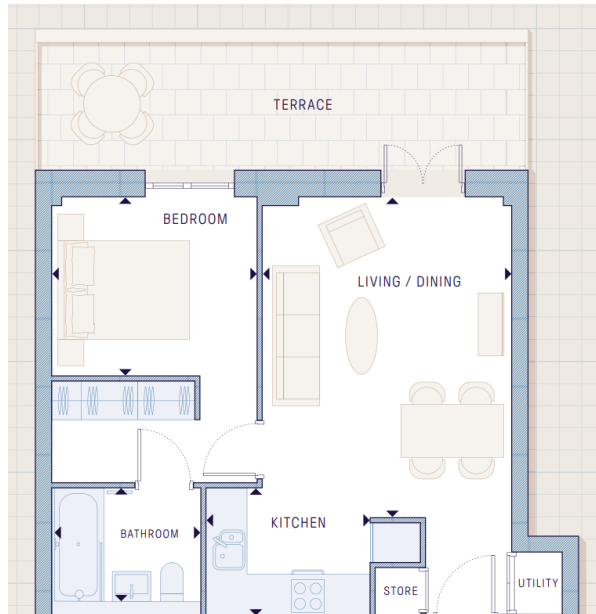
Floorplan showing rooms and appliances of a one-bed apartment.
